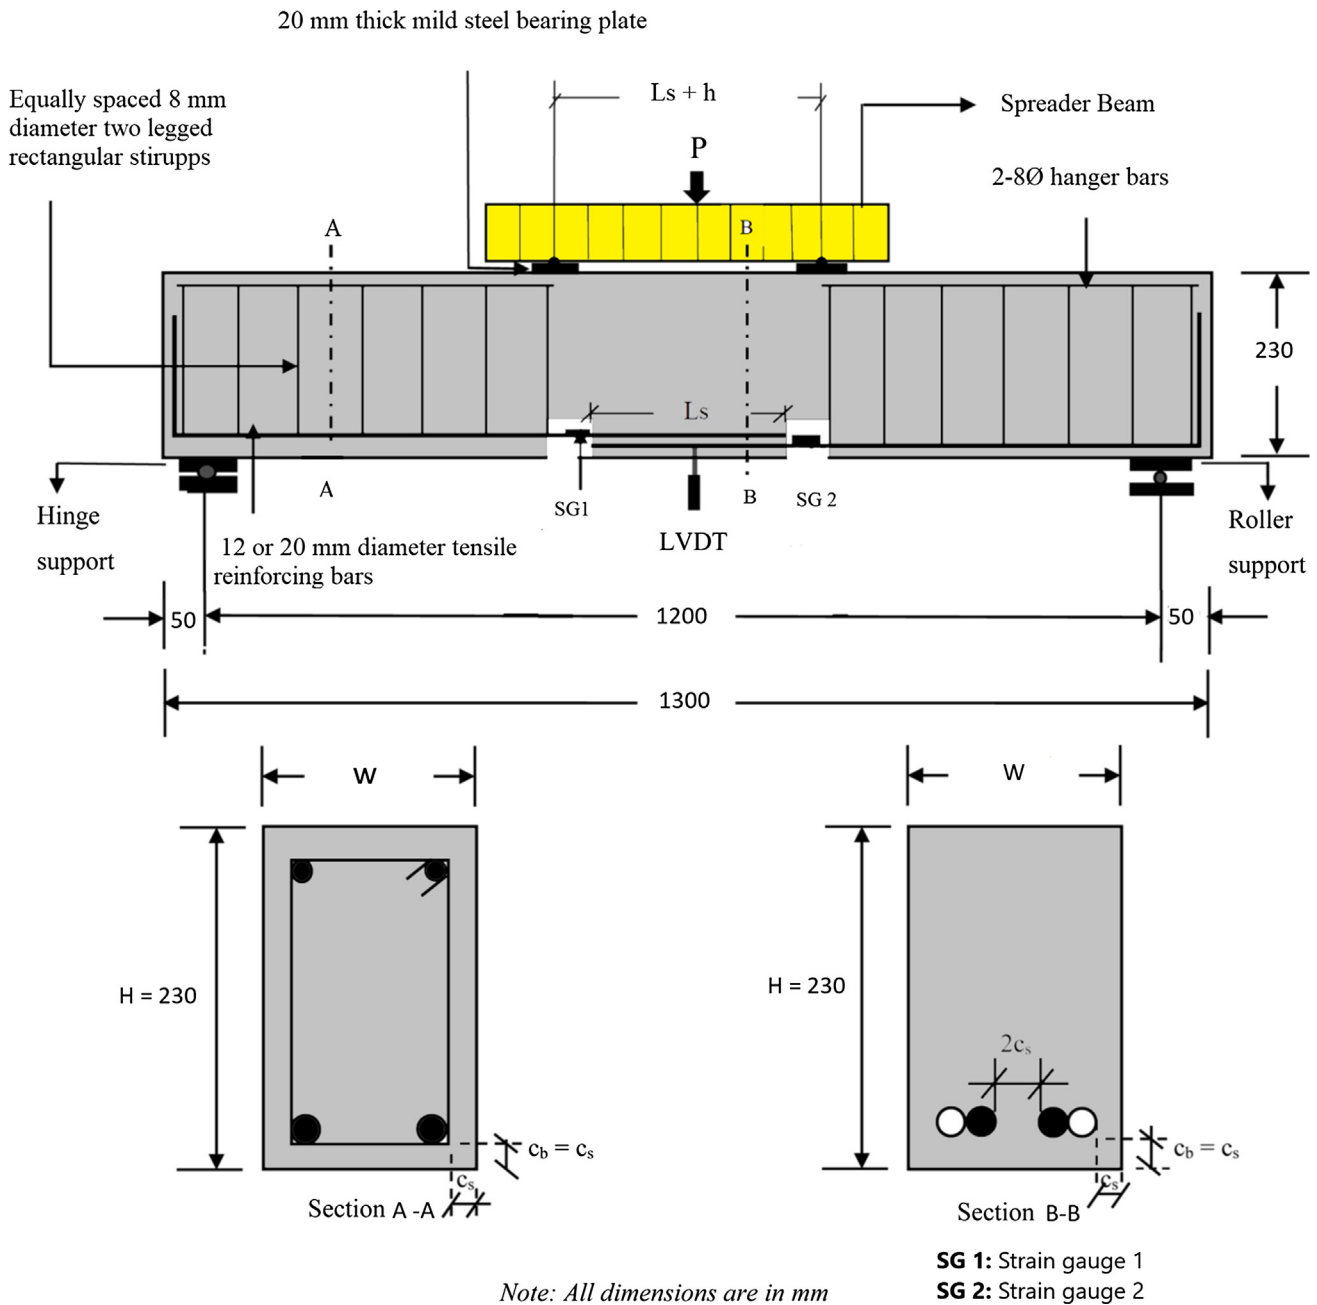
Geometrical details and the loading arrangement of the beam specimens.
